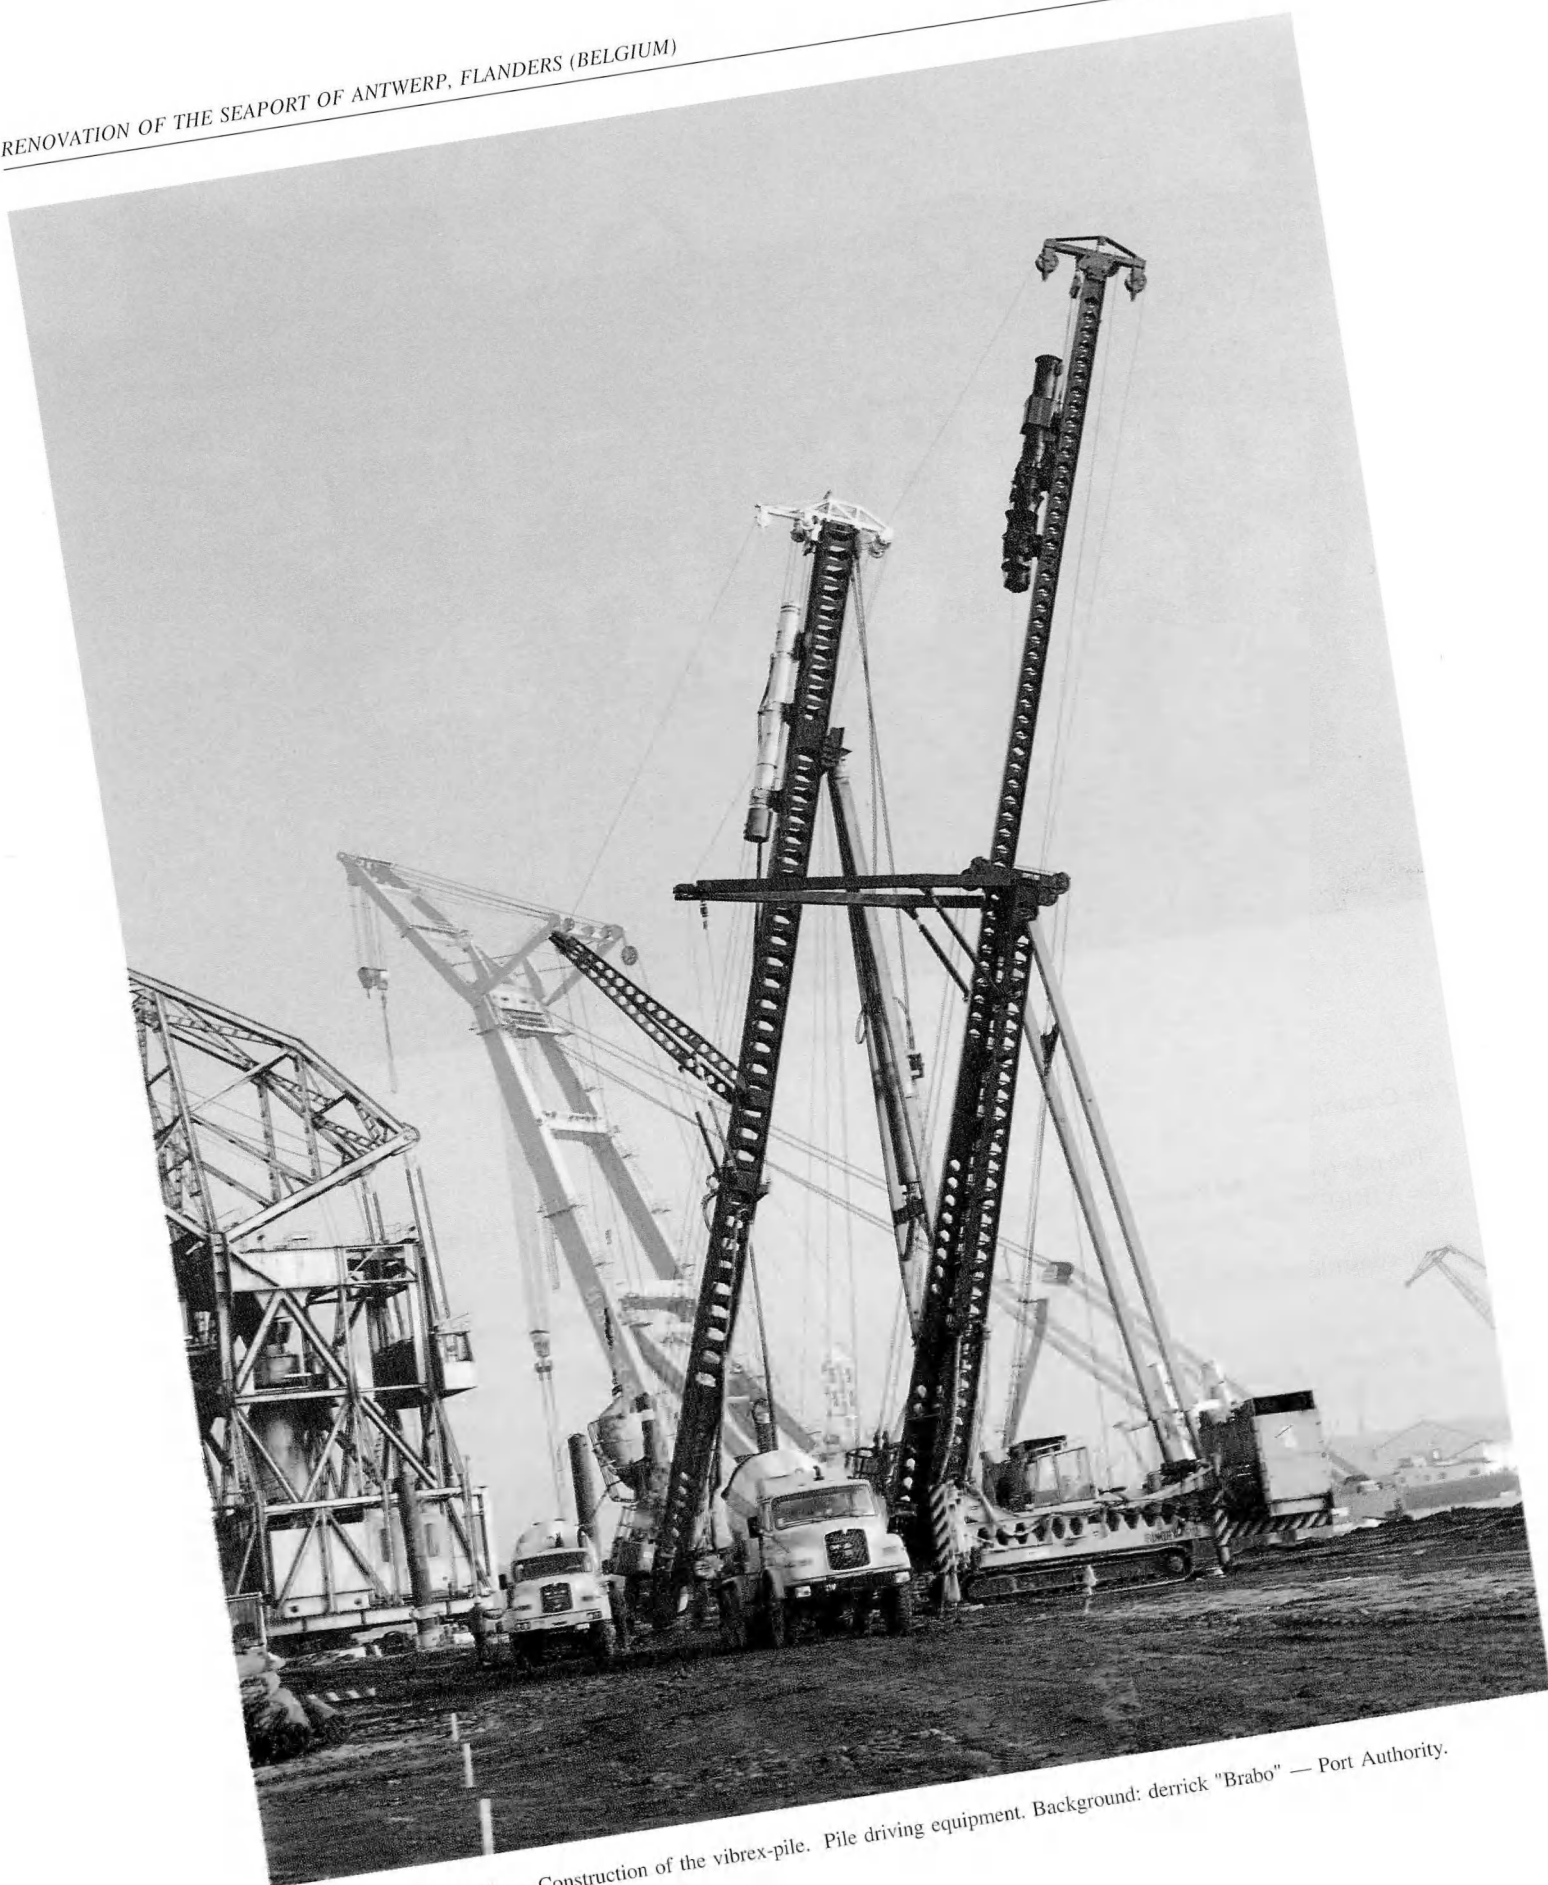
Construction of the vibrex-pile. Pile driving equipment. Background: derrick "Brabo" — Port Authority.
